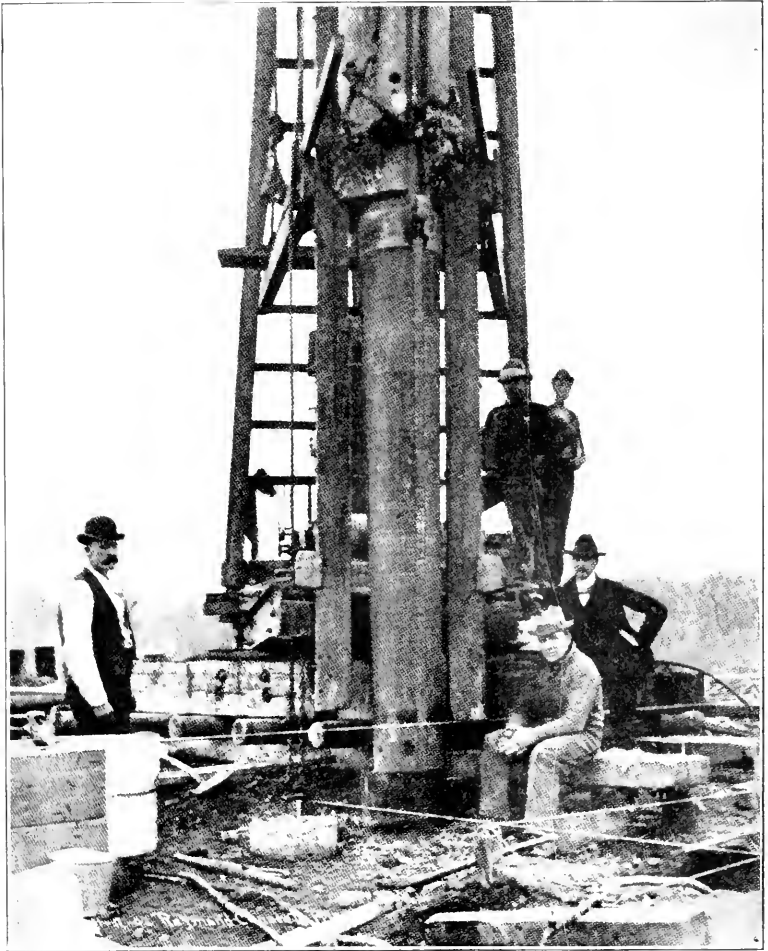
Pile Core Collapsed or Shrunken, and partly withdrawn from the shell.
